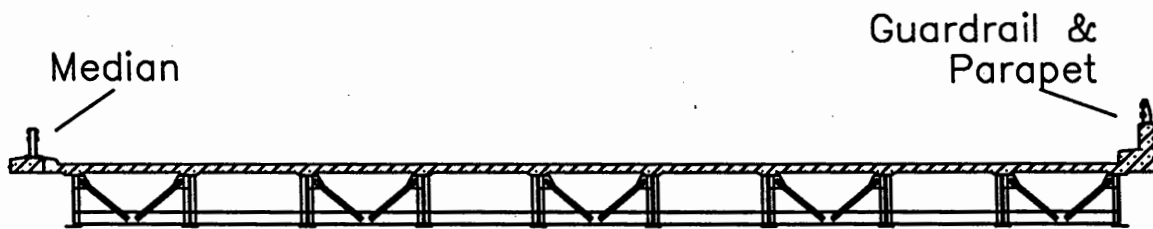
TYPICAL SPAN CROSS-SECTION SHOWING DIAPHRAGM ARRANGEMENT
